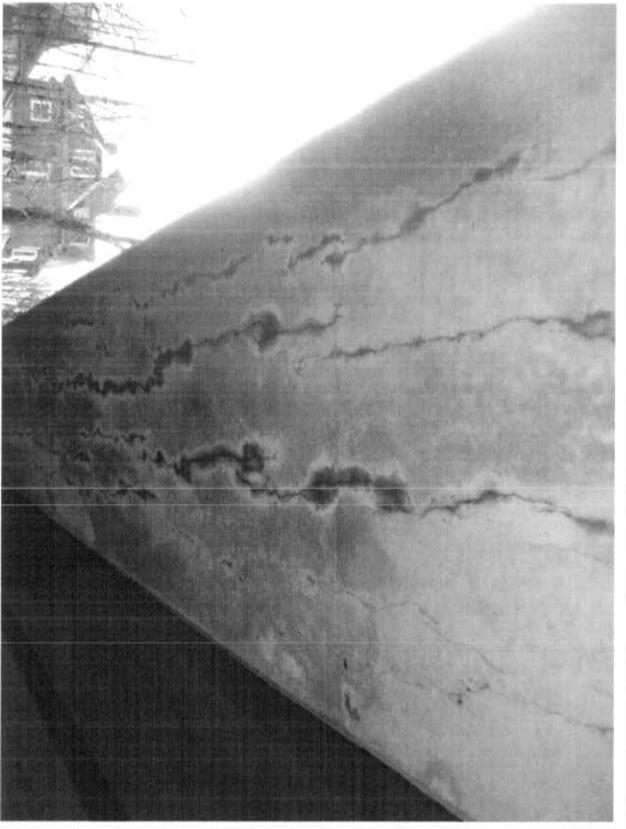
GENERAL VIEW OF HOLE IN GIRDER # 5 IN SPAN # 2 NEXT TO PIER.
